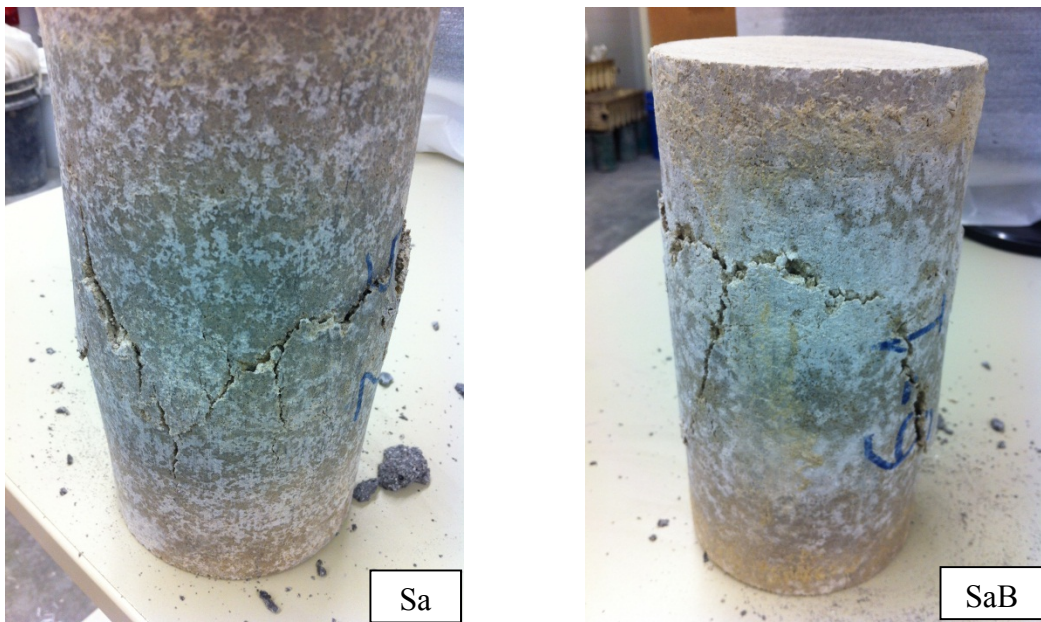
Typical failure of cylinder specimens of mixes Sa and SaB
